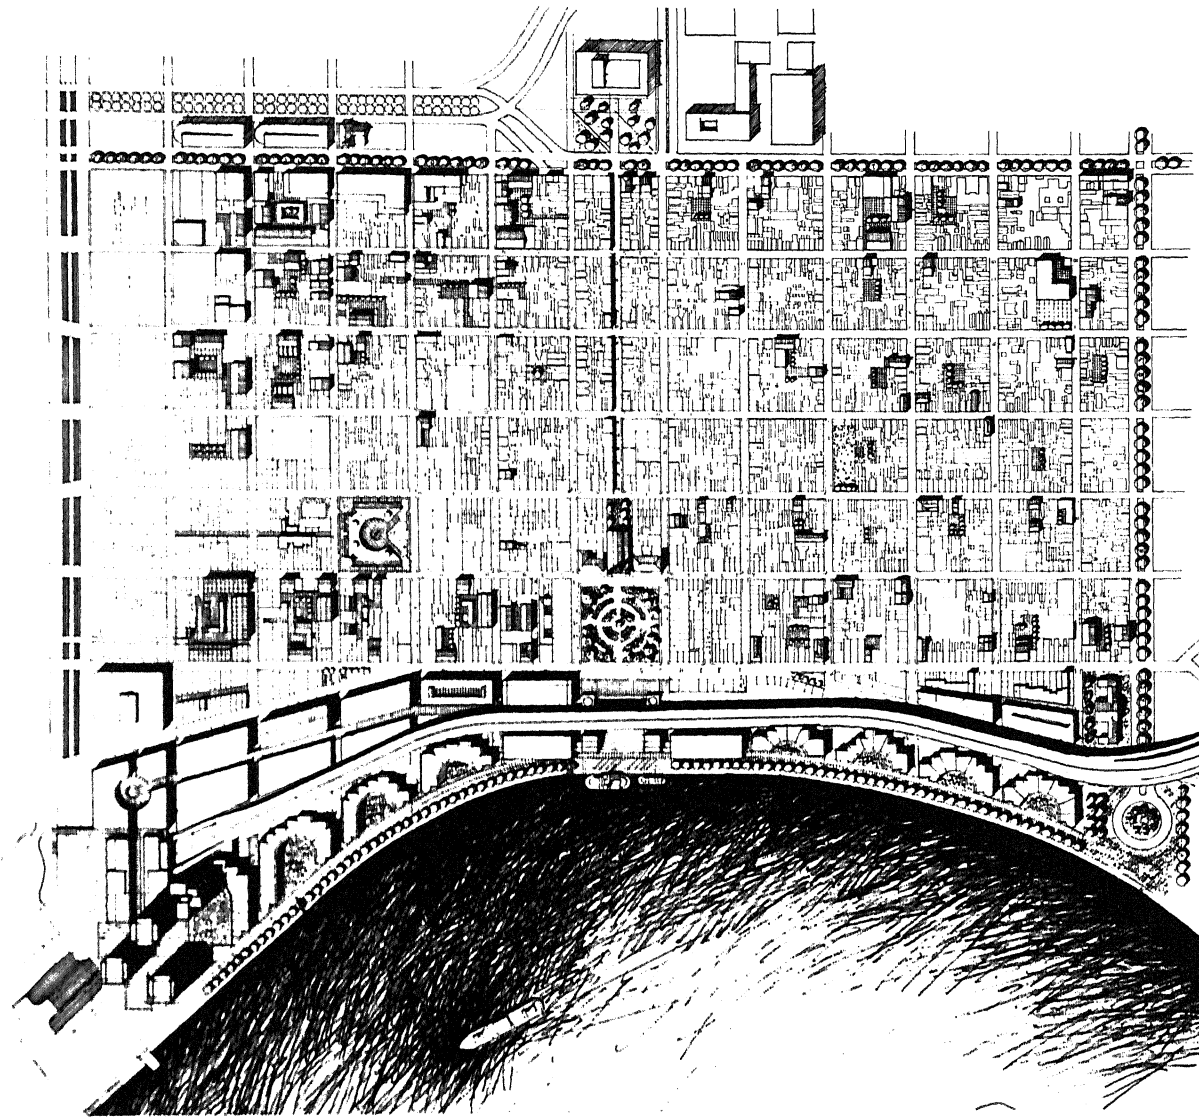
Long range illustrative site plan-riverfront expressway elevated
